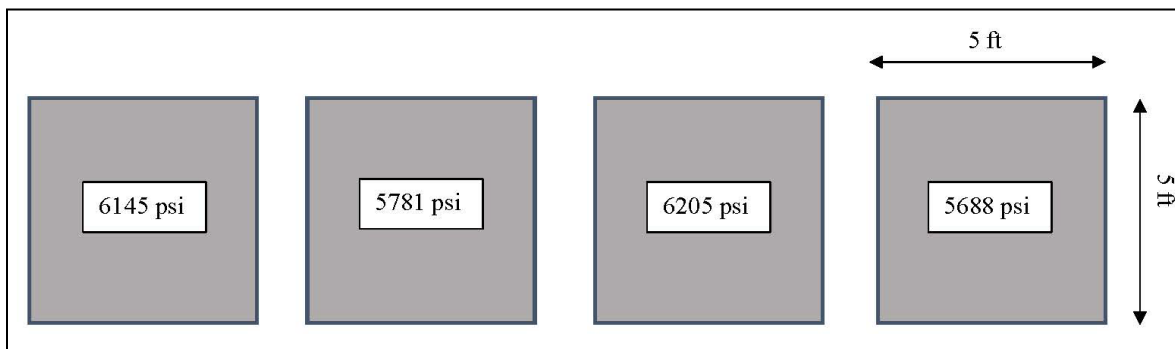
Concrete test slabs with respective 28 days compressive strengths (f'_c)
